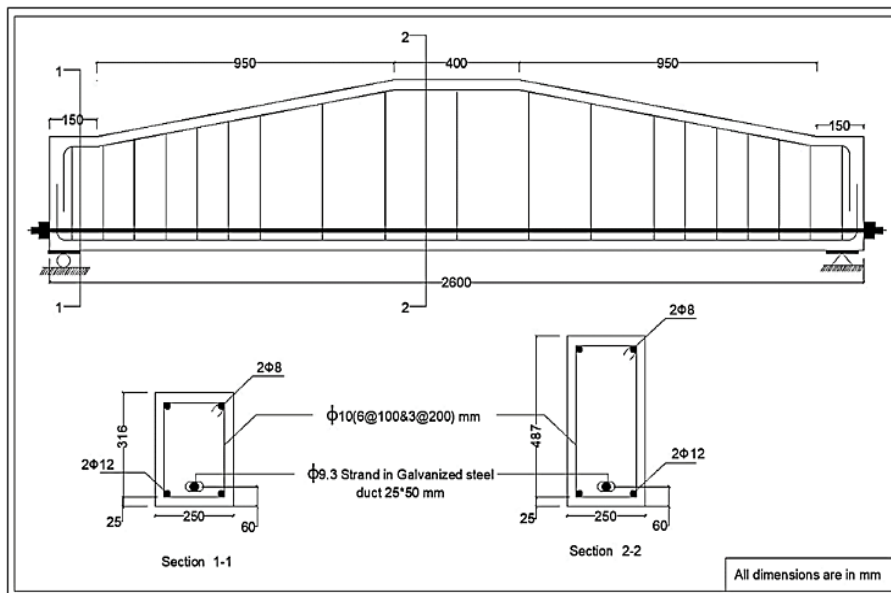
Specifications of the beams B1.5-1 and B'1.5-1
